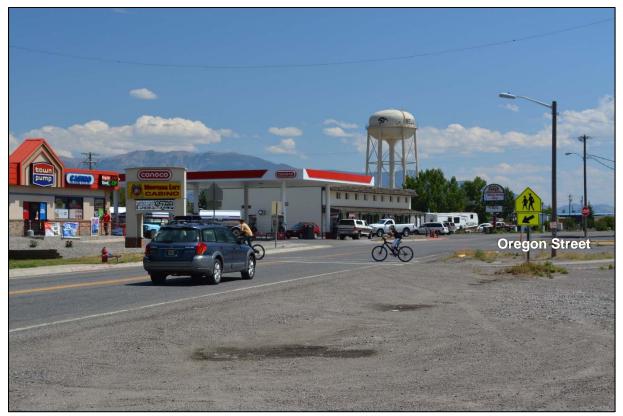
Pedestrian crossing near Oregon Street (RP 20.4)
